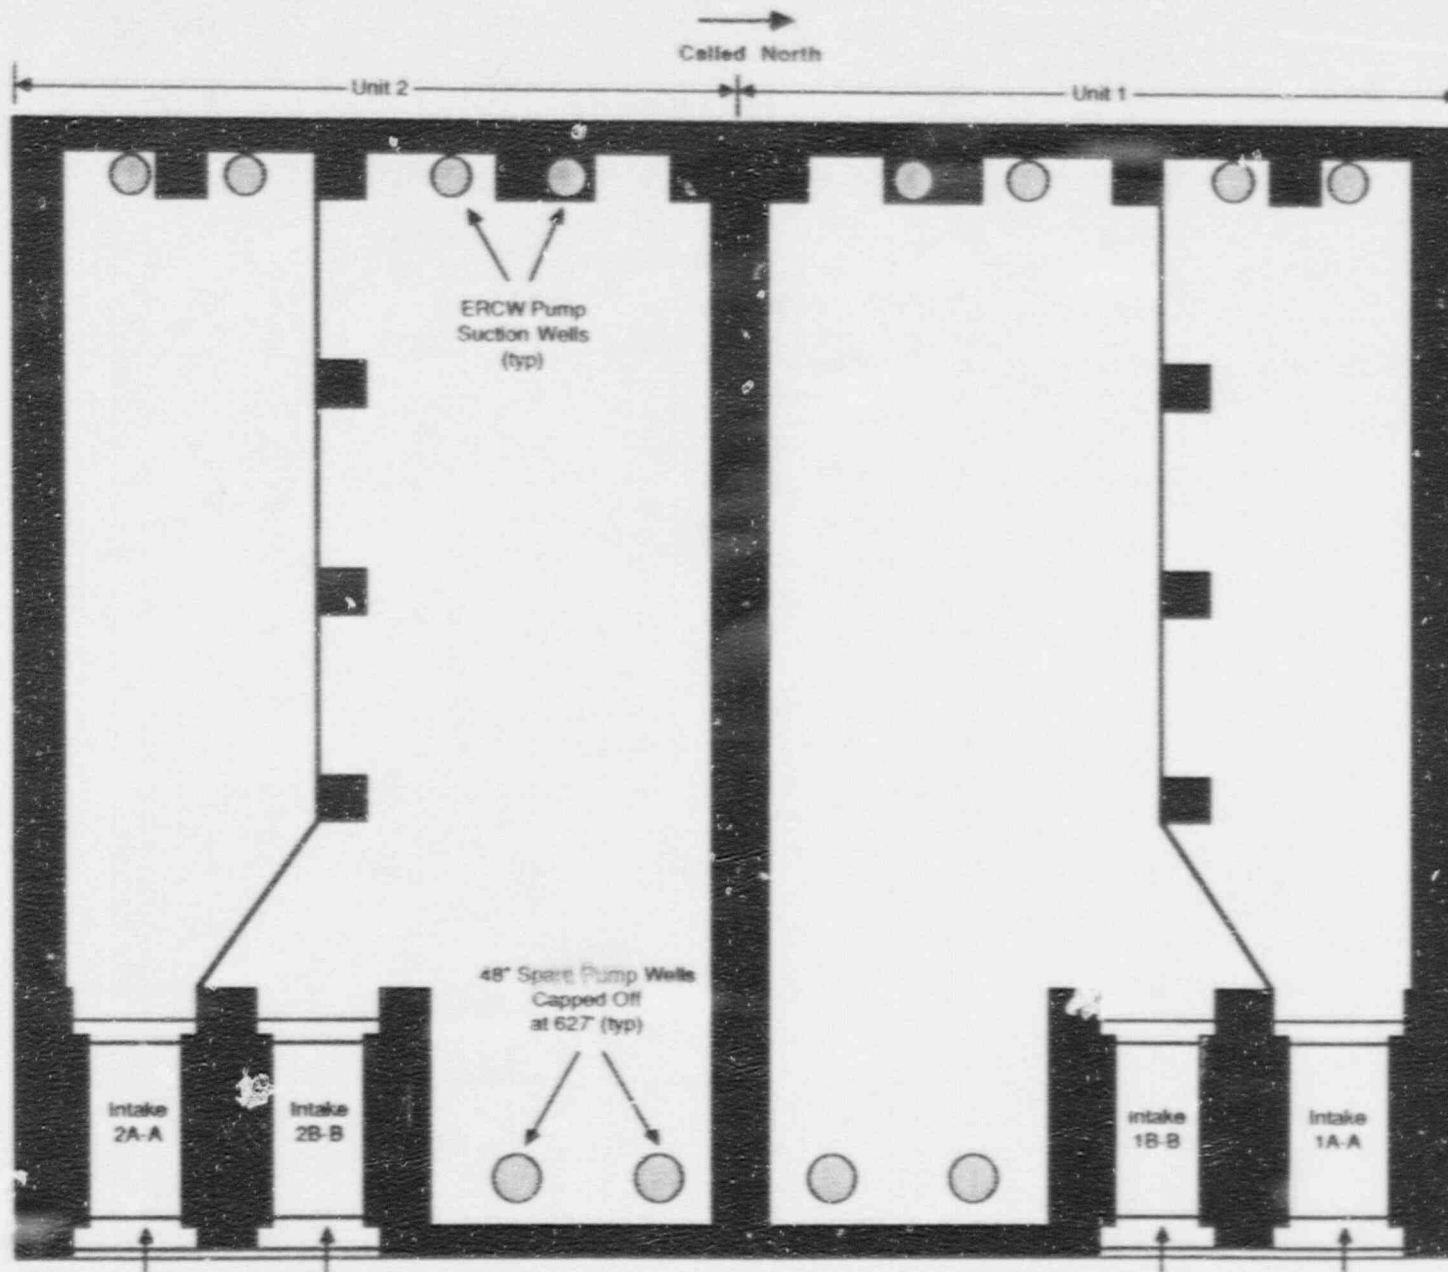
Bellefonte 1 and 2 Intake Pumping Station, Elevation 557'-0"
